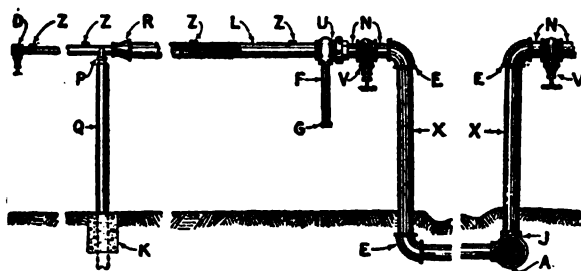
Fittings for overhead nozzle line system: A, main feed line; D, drain cock; E, elbow; F, handle for turning nozzle line; G, capon handle; J, side outlet tee; K, concrete base for pipe pact; L, nozzle-line pipe; N, nipples; P, pipe hanger or support; Q, pipe post; R, reducing fixture; U, turning union; V, gate valve; X, risers to nozzle line; Z, nozzles.
